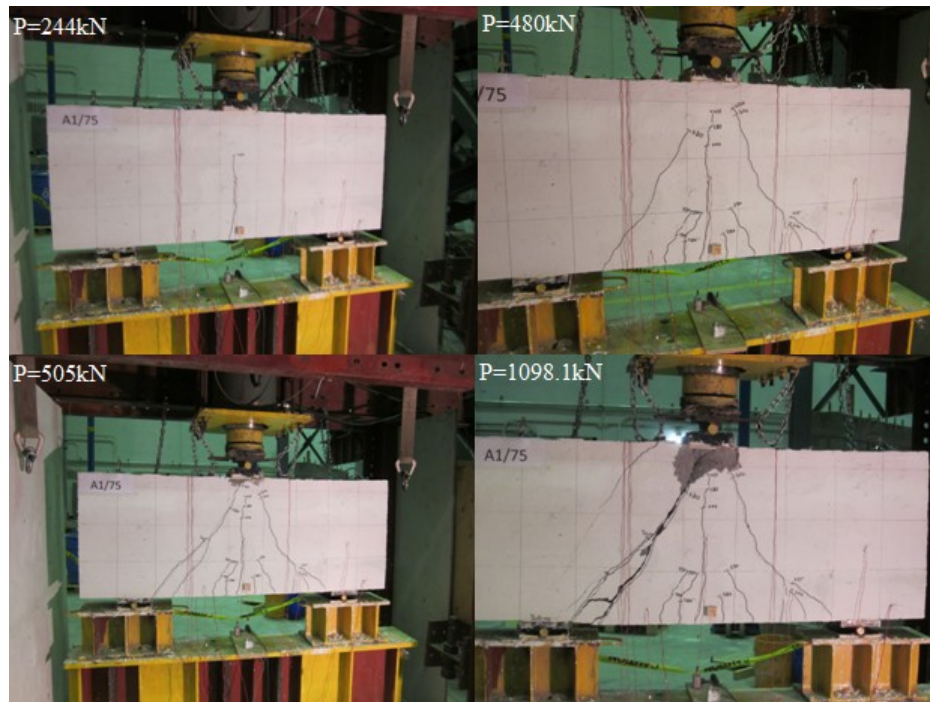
The propagation of the crack patterns in the beam A1/75 at four different loading stages
